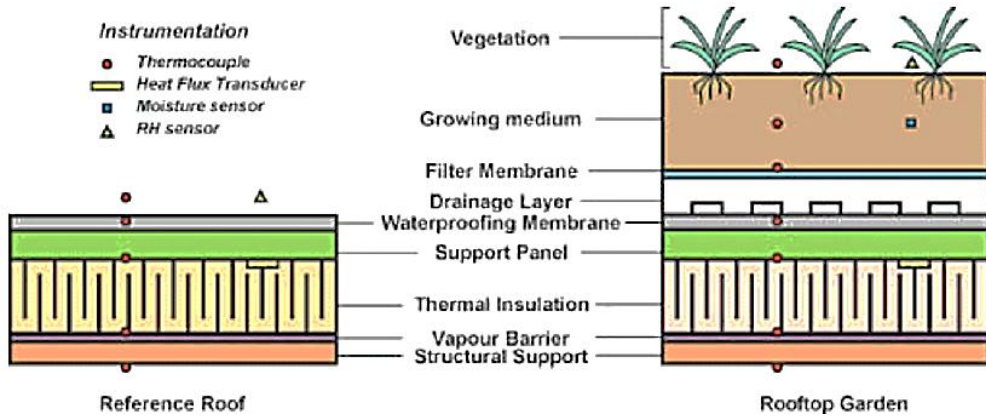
The comparison between the rooftop garden and the ordinary roof
